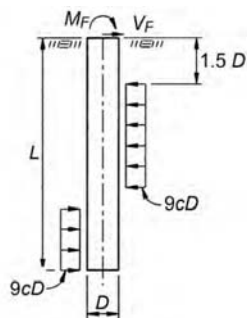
Foundation in Cohesive Soil
